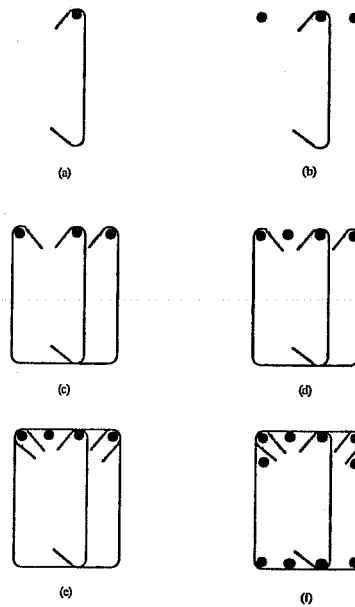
Assembly of WWF beam cage for Specimen J6
